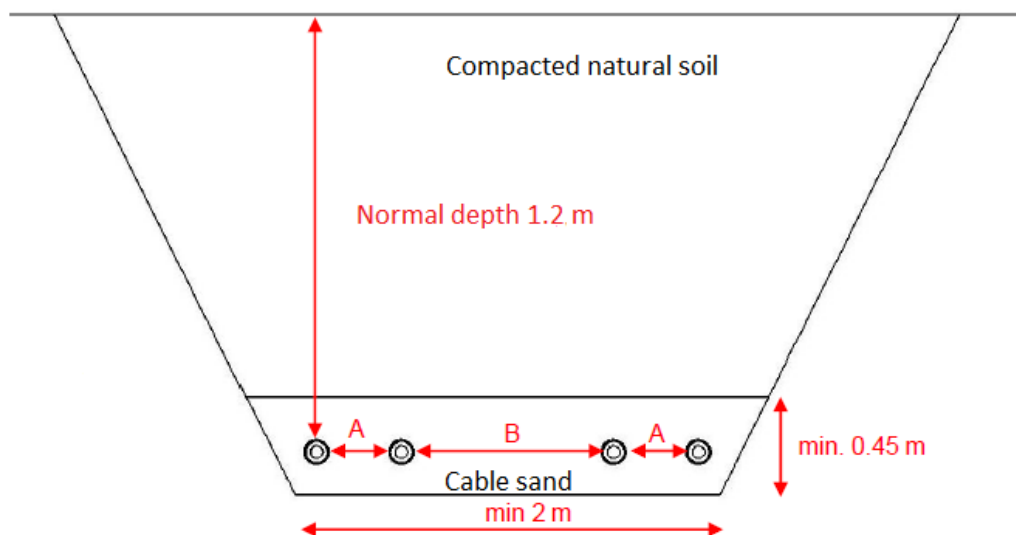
Principle of the cable trench in soil with 4 cables at the Southwest Link.
